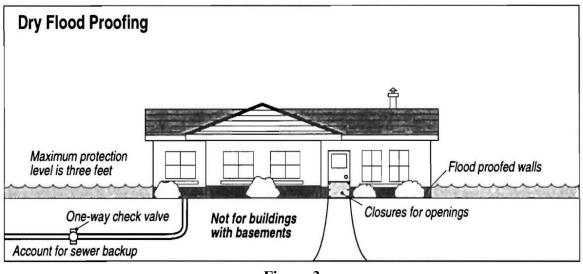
Dry Flood Proofing (Diagrammatic Detail)
